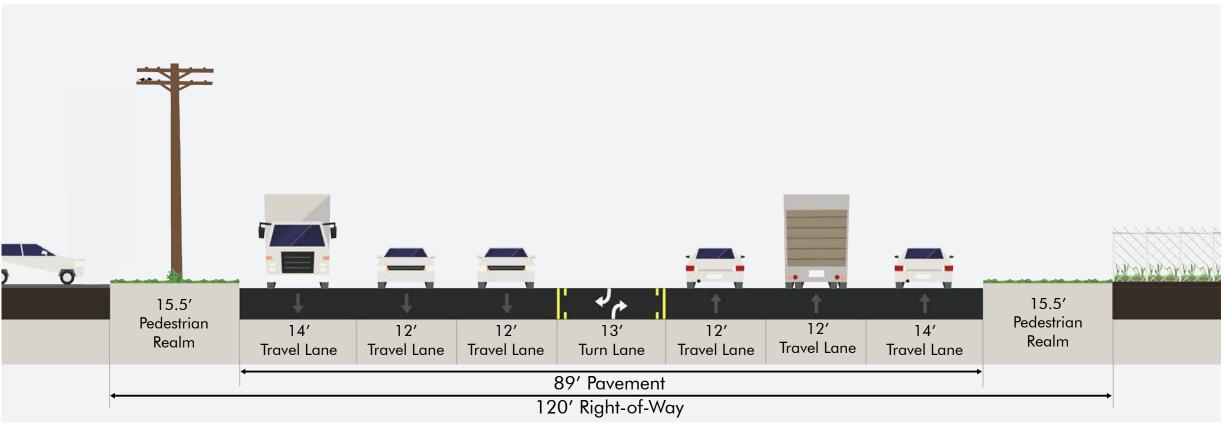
FM 1092 Study Corridor Typical Cross Section
